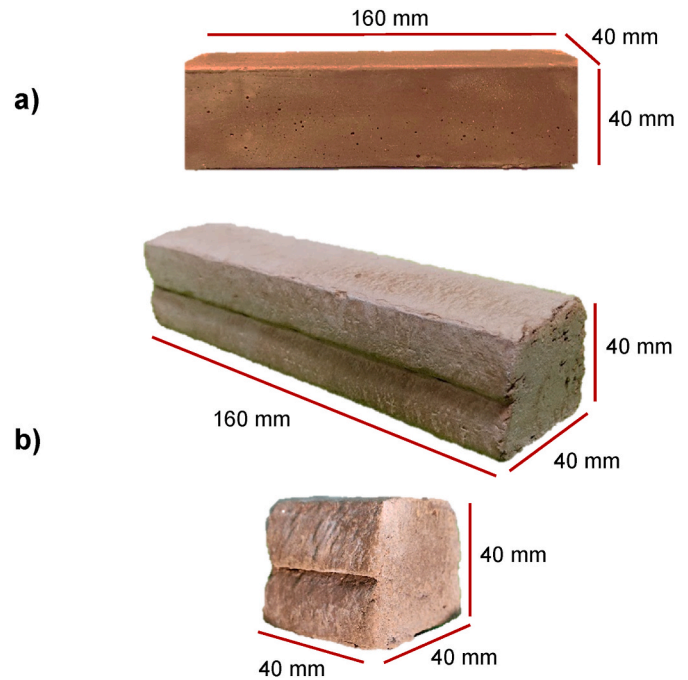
Representative images showing the details of test specimens: a) Prismatic mold-casted specimen, b) prismatic and cubic 3D-printed specimens.
